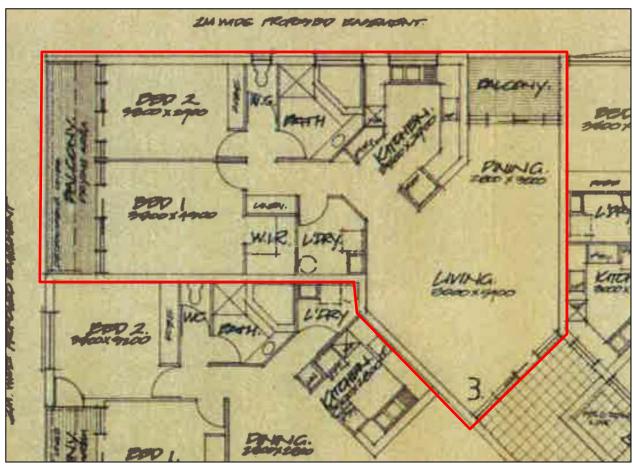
B: Approved floor plan – Unit 3 (enlarged)
